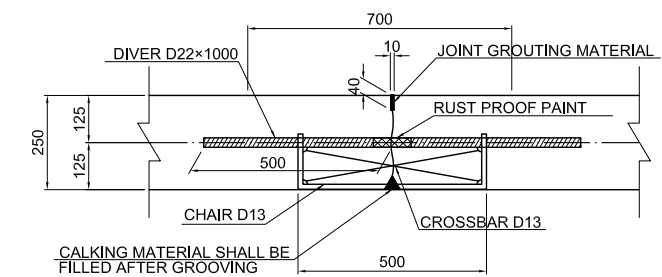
DETAIL OF TRANSVERSE CONTRACTION JOINT
